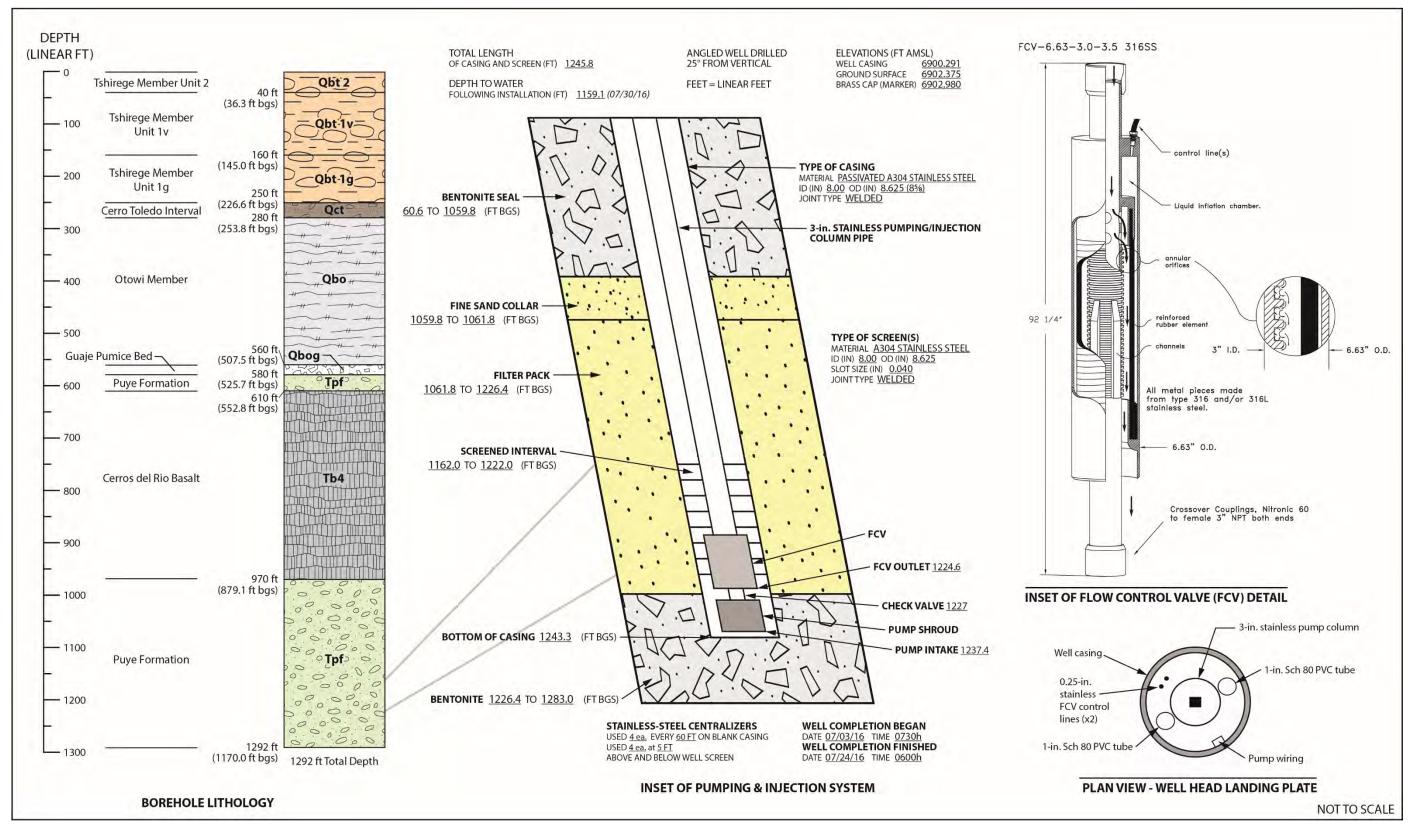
Injection well CrIN-5 as-built diagram with borehole lithology and technical well completion details
